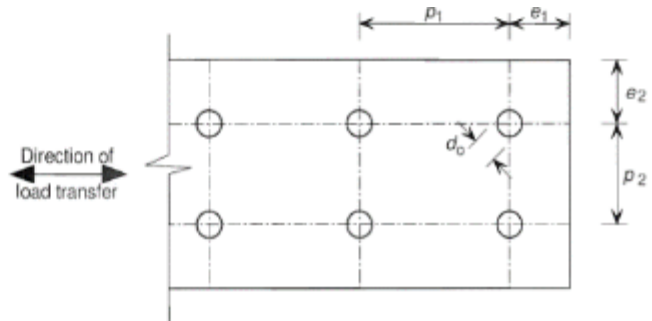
End distance, edge distance and spacings for fasteners and spot weld
